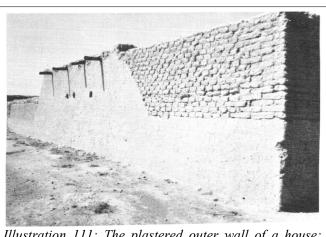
The plastered outer wall of a house; note the roof beams (Aurenche 1981, 135).
